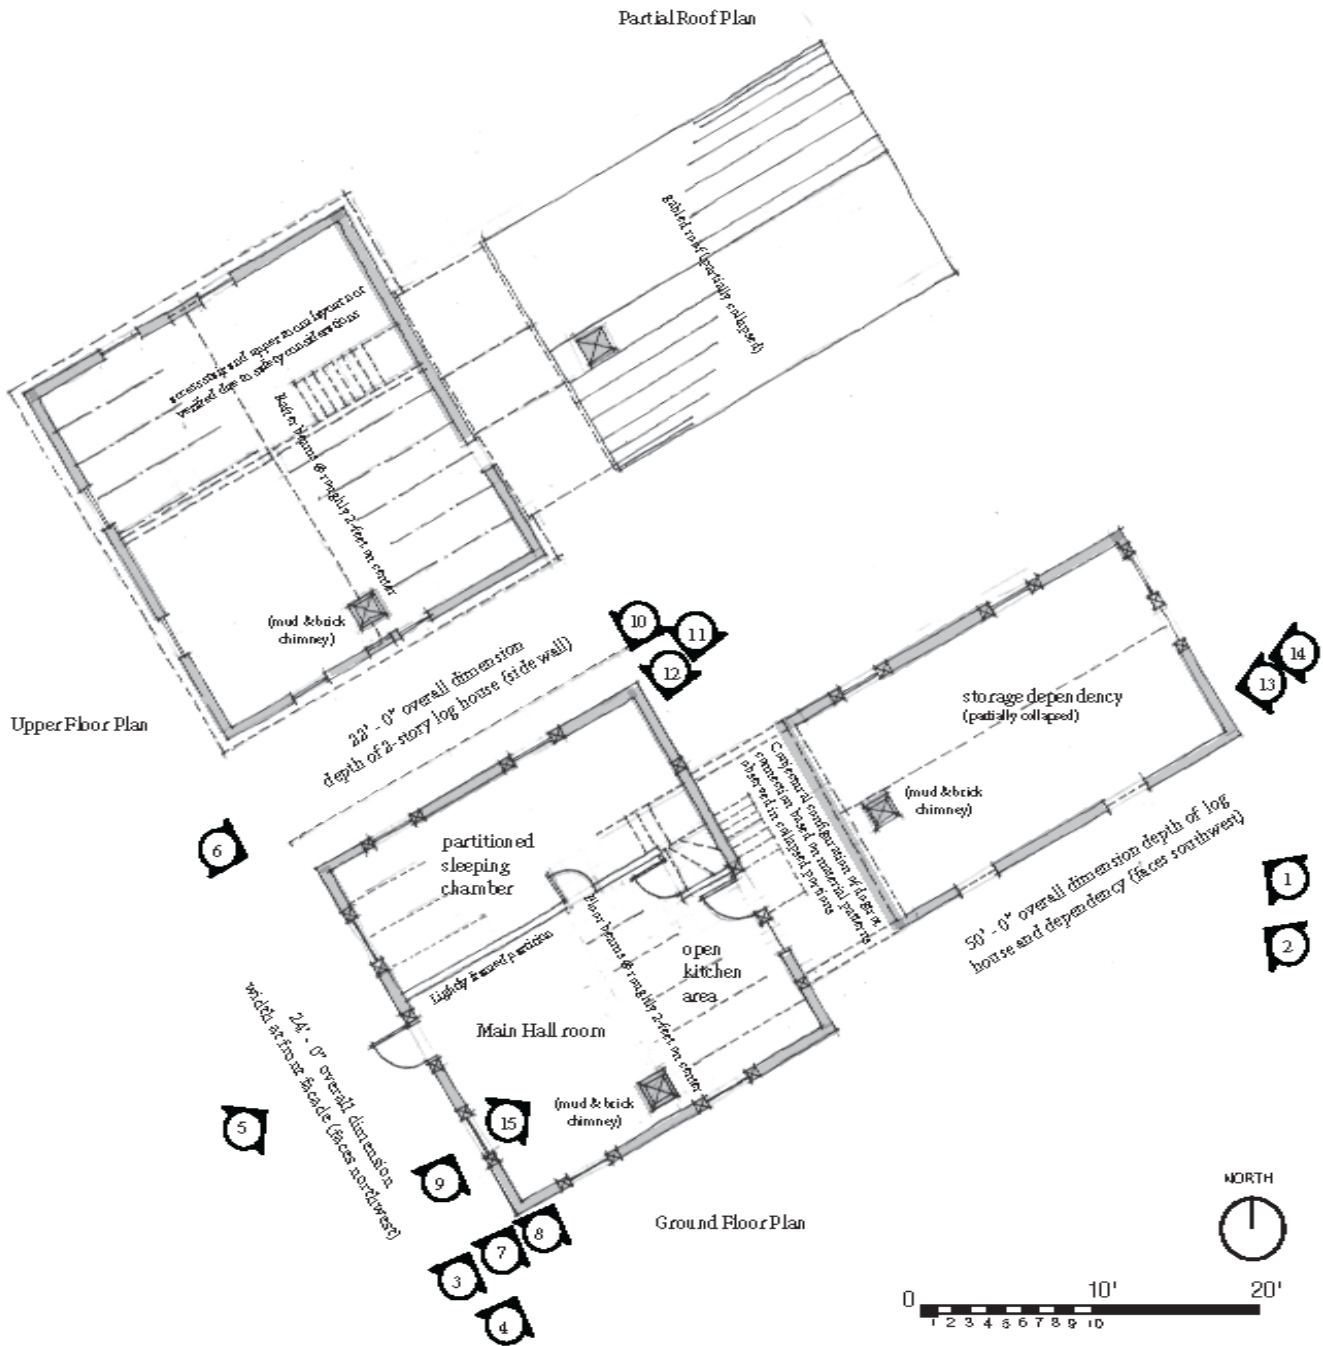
Ground floor and upper floor sketch plans of Dease-Martineau log house; Pembina County, North Dakota
